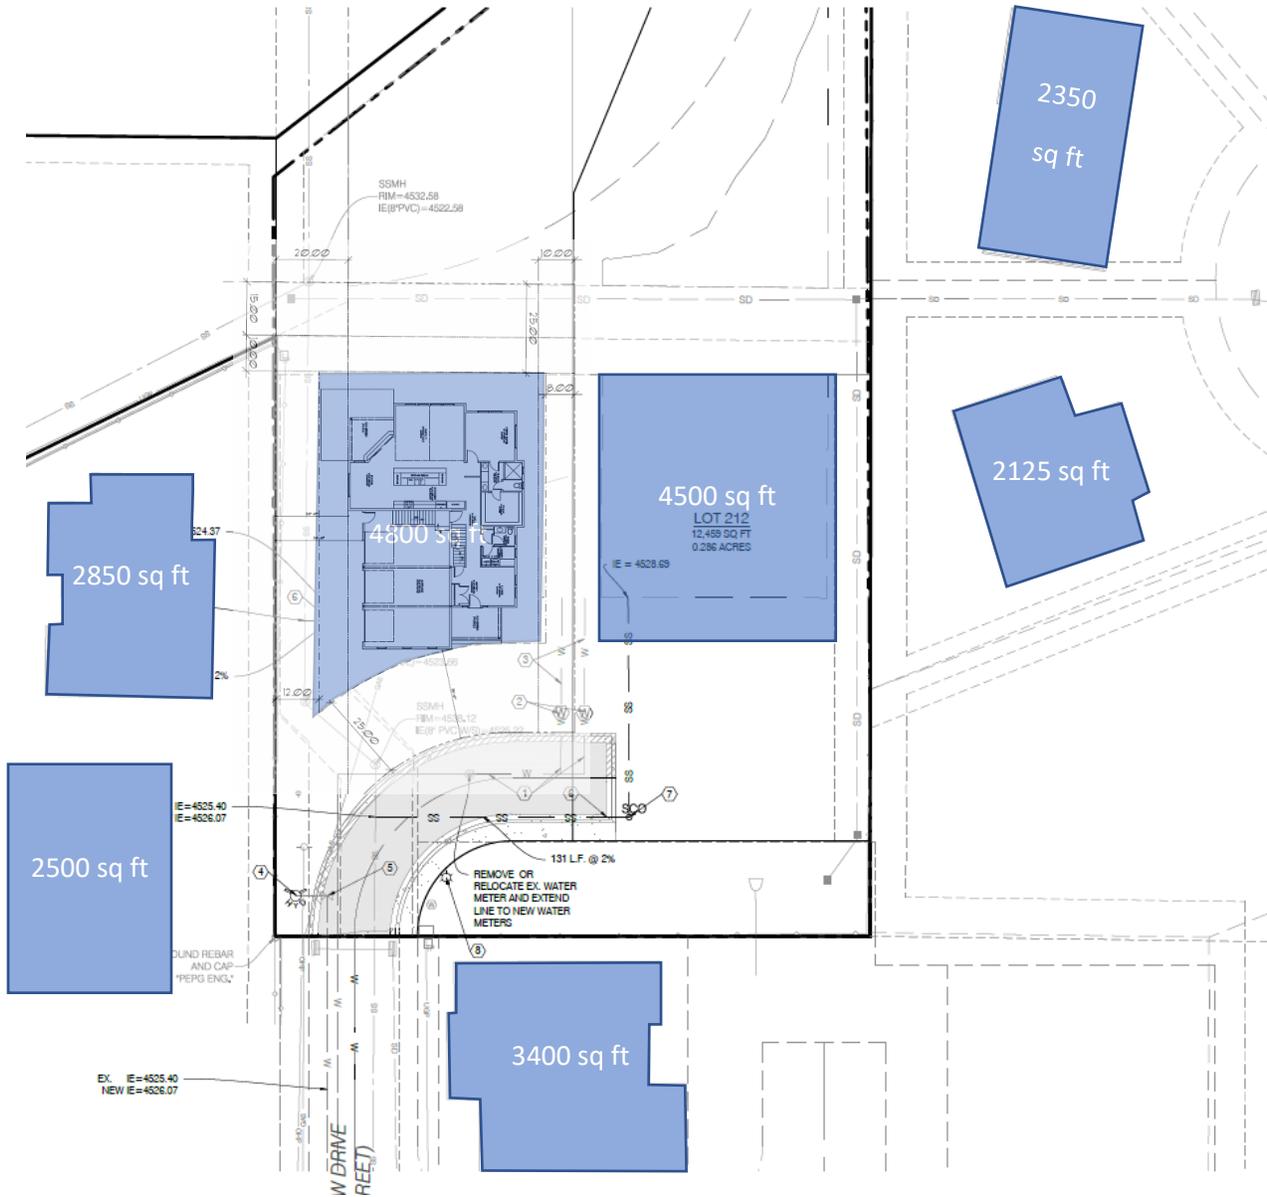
Approximate Size of Proposed Building Pad and Existing Buildings
